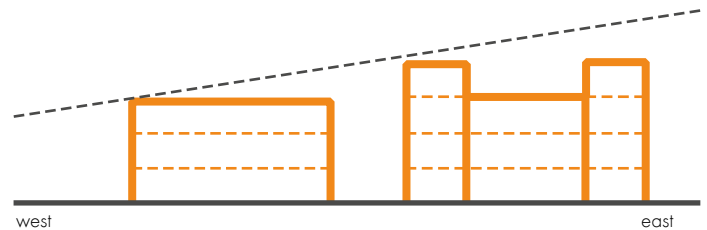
Illustrative section showing layering of building heights at York Yard Gateway
